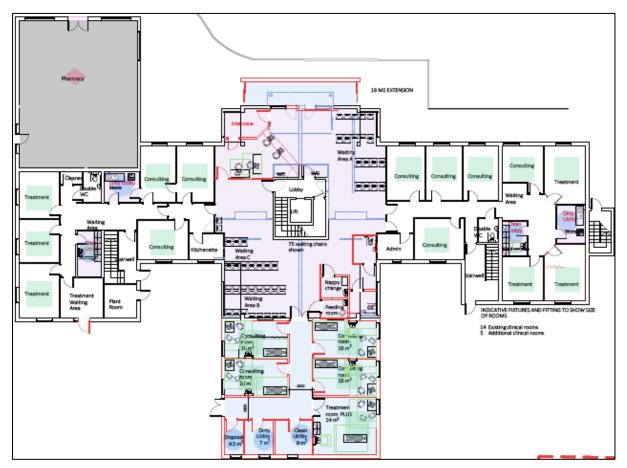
Sprowston – proposed Hub Ground Floor Plan
